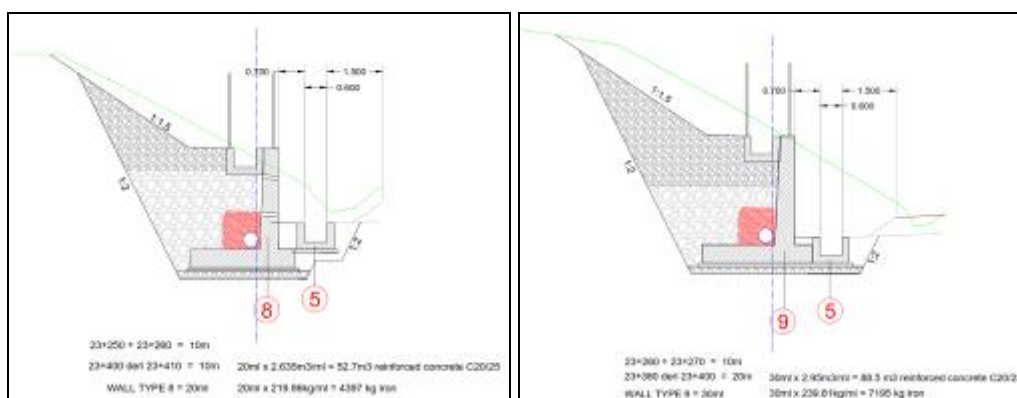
Designed retaining wall within the territory of Vore Municipality
